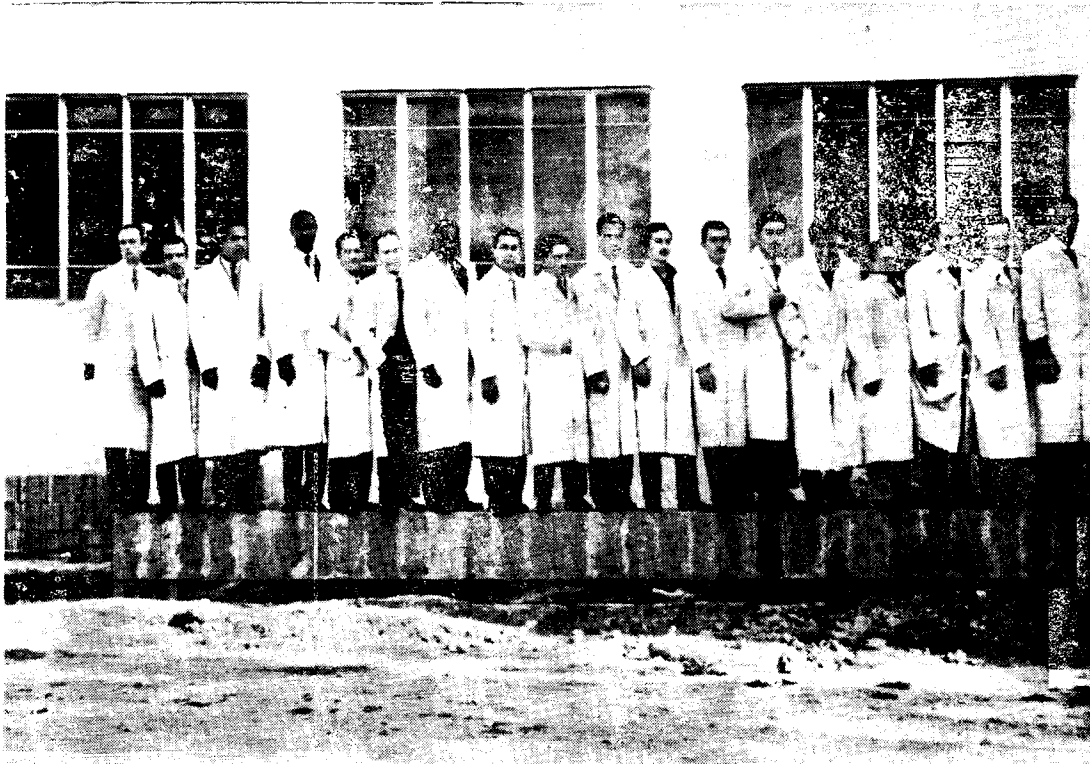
The foundation beam is raised and supported at its ends while trainees of the Inter-American Housing Center demonstrate its resistance by standing on it. Foundation was part of a structure developed in study of the design of a housing unit at the Center.
